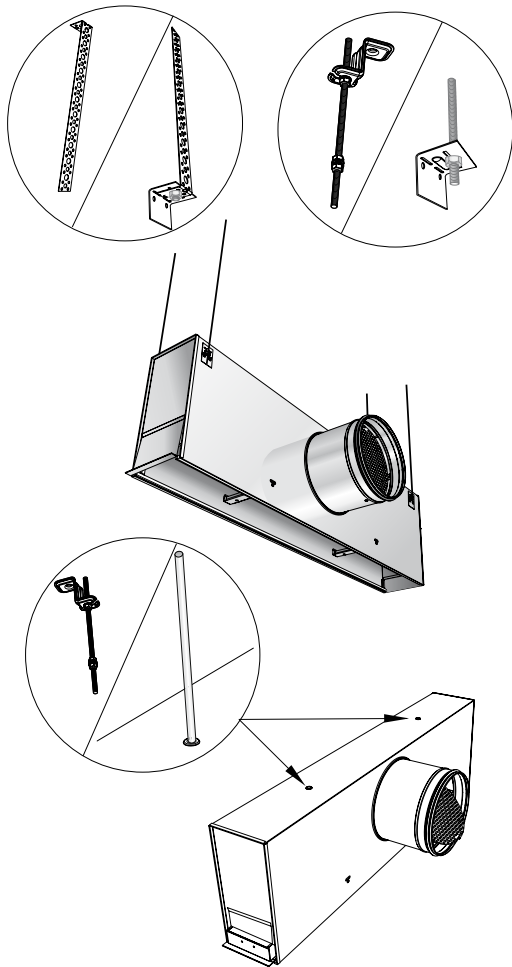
Alternative installation with threaded rods, mounting strips or wire.
